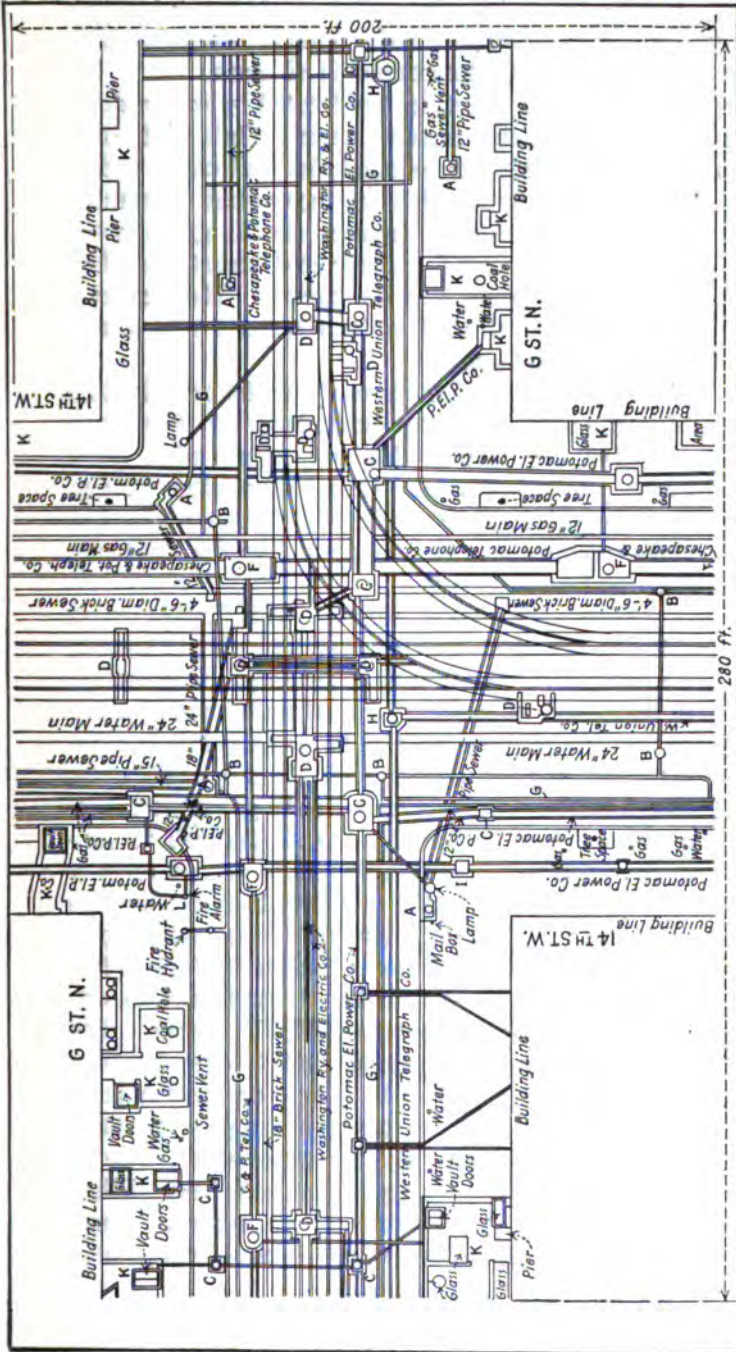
Record Map of Underground Structures, Washington, D. C.
